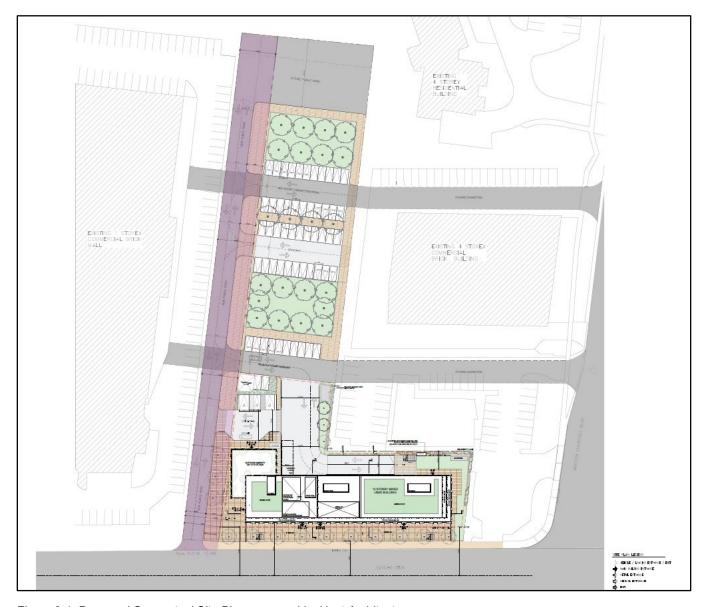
Proposed Conceptual Site Plan, prepared by Hout Architecture
